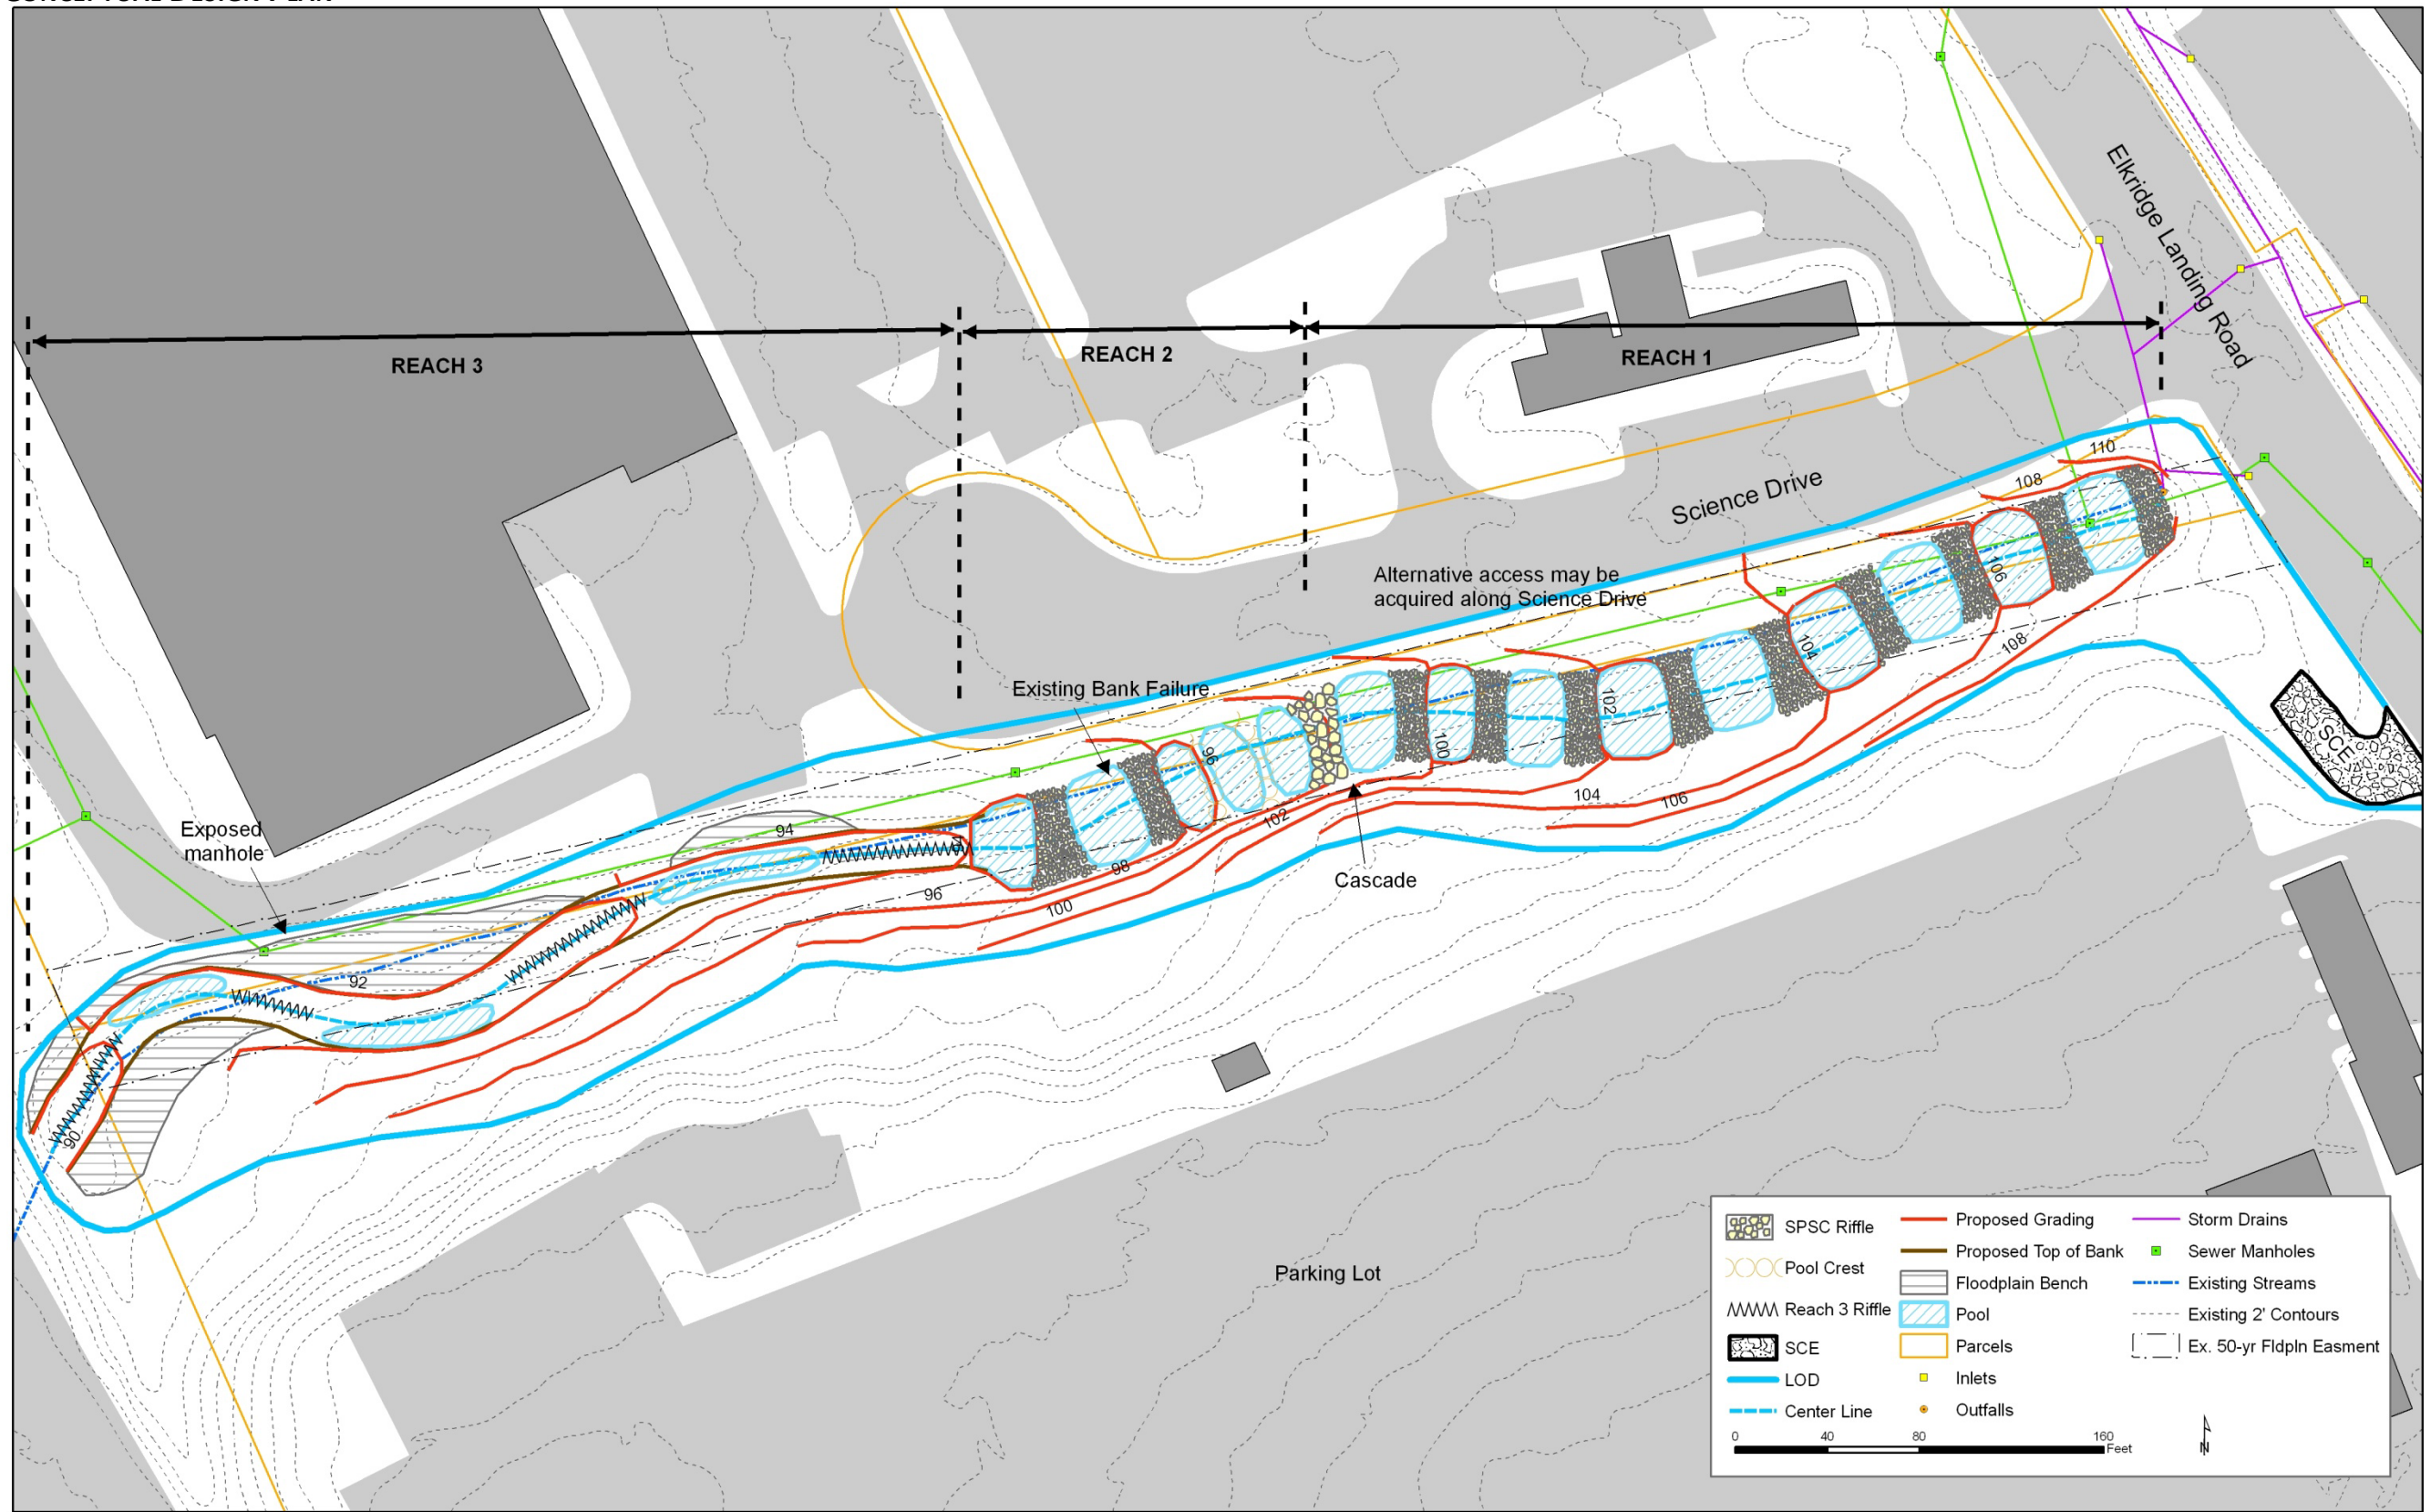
PLAN VIEW CONCEPTUAL SITE SKETCH
